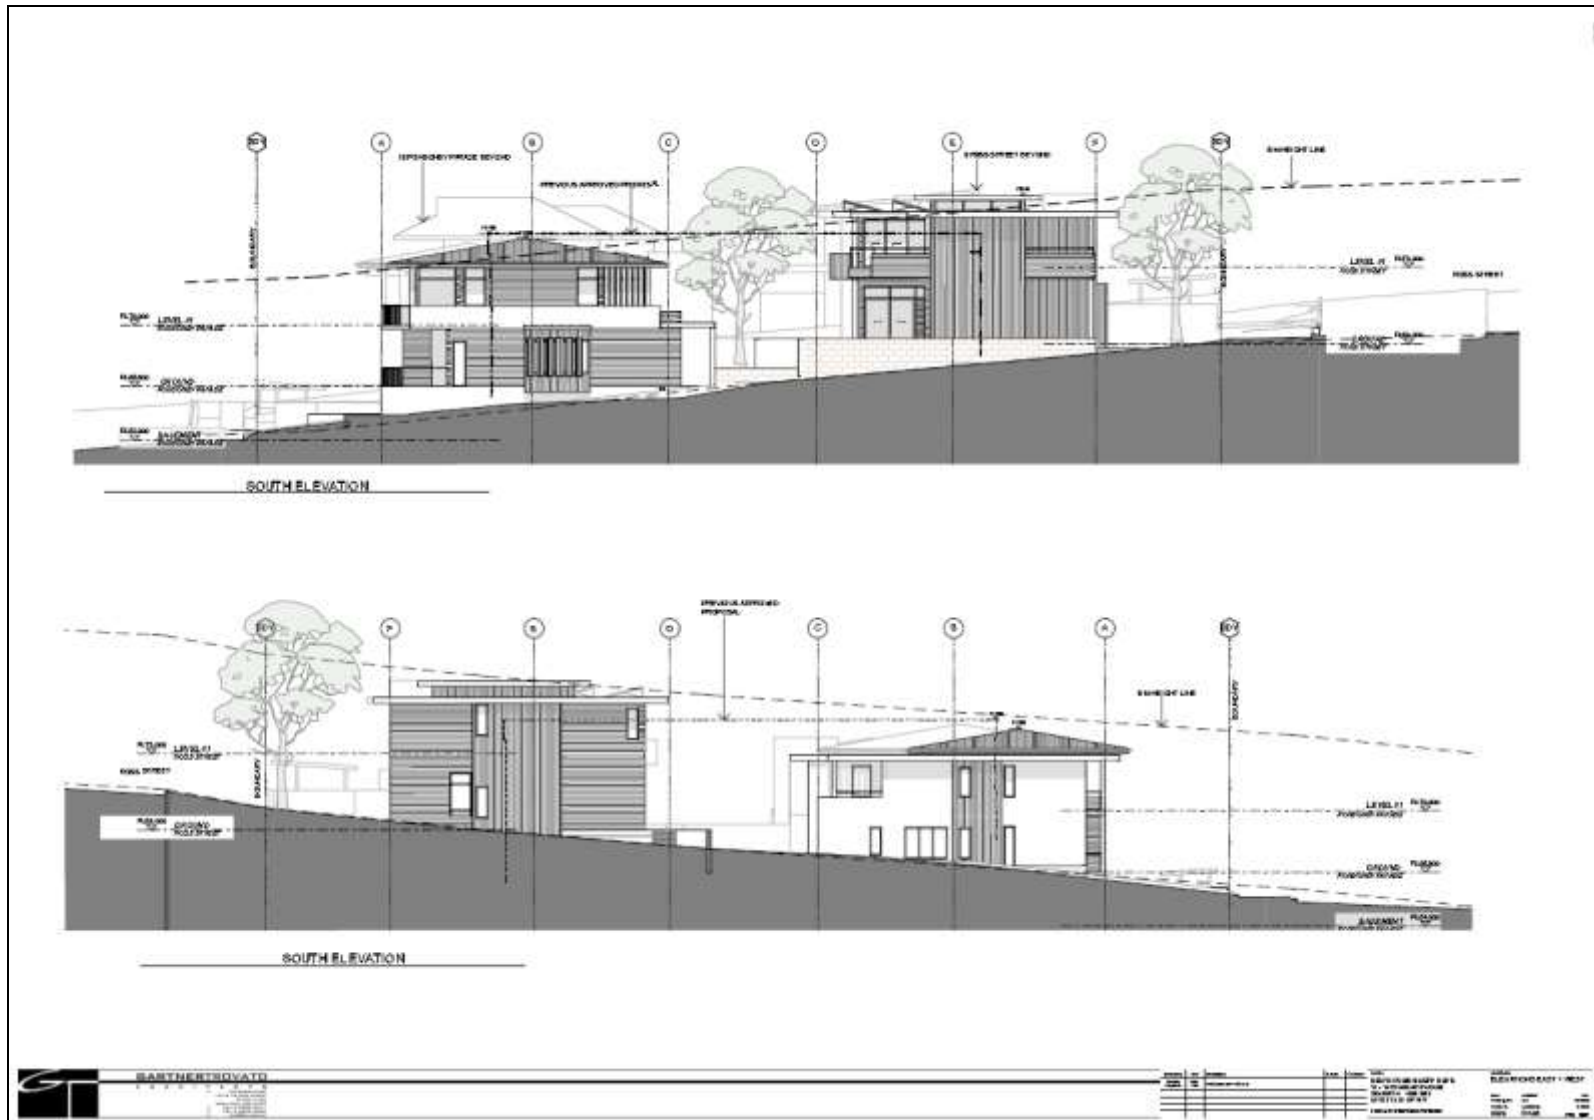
Illustrates (page 8) Proposed Ground Floor Plan with tree locations & proposed Elevations.
